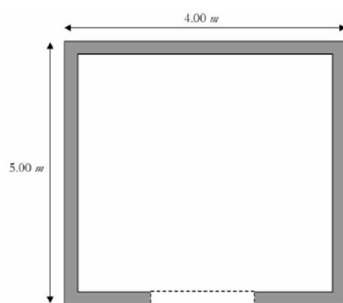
typical plan of single unit construction Fig. 5 typical plan shape of double unit construction
